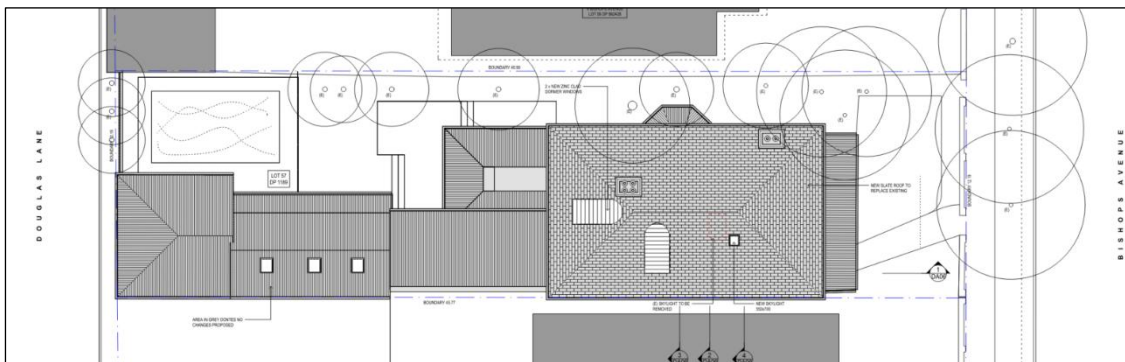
Extracted from Site / Roof Plan (Source: Source Architects Pty Ltd)
